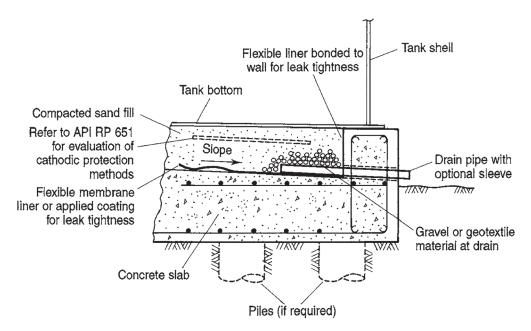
Reinforced concrete slab with undertank leak detection at the perimeter (from API, 2005)
